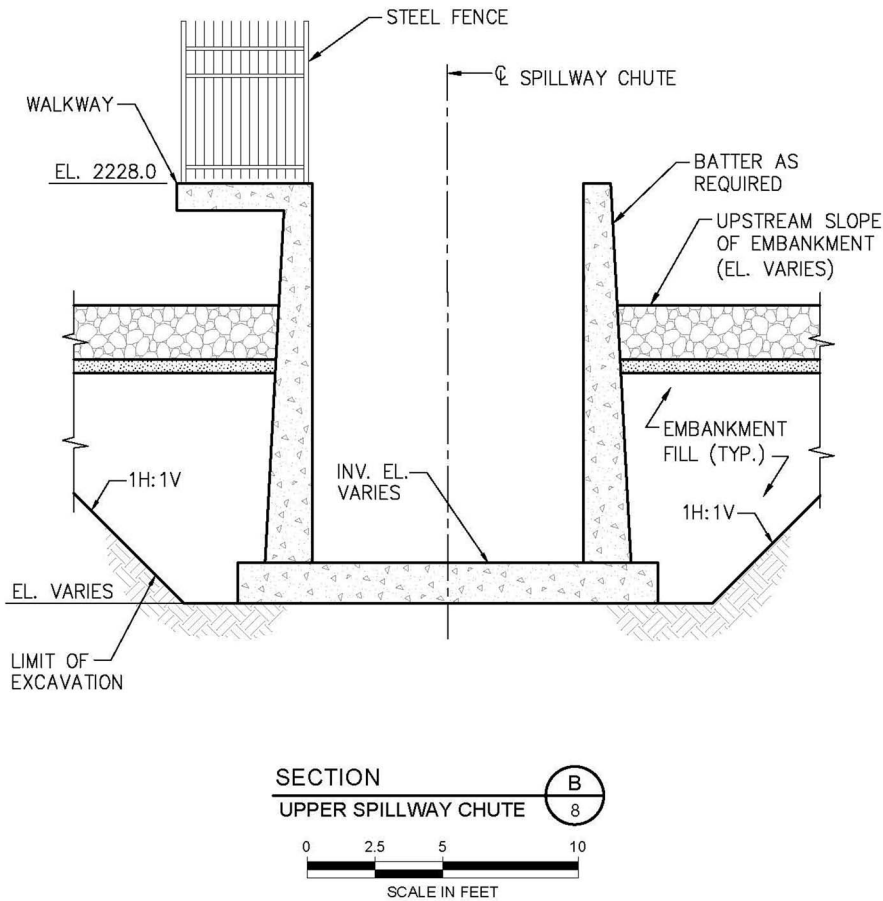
P-10. Section B Upper Spillway Chute, before Dimensioning
